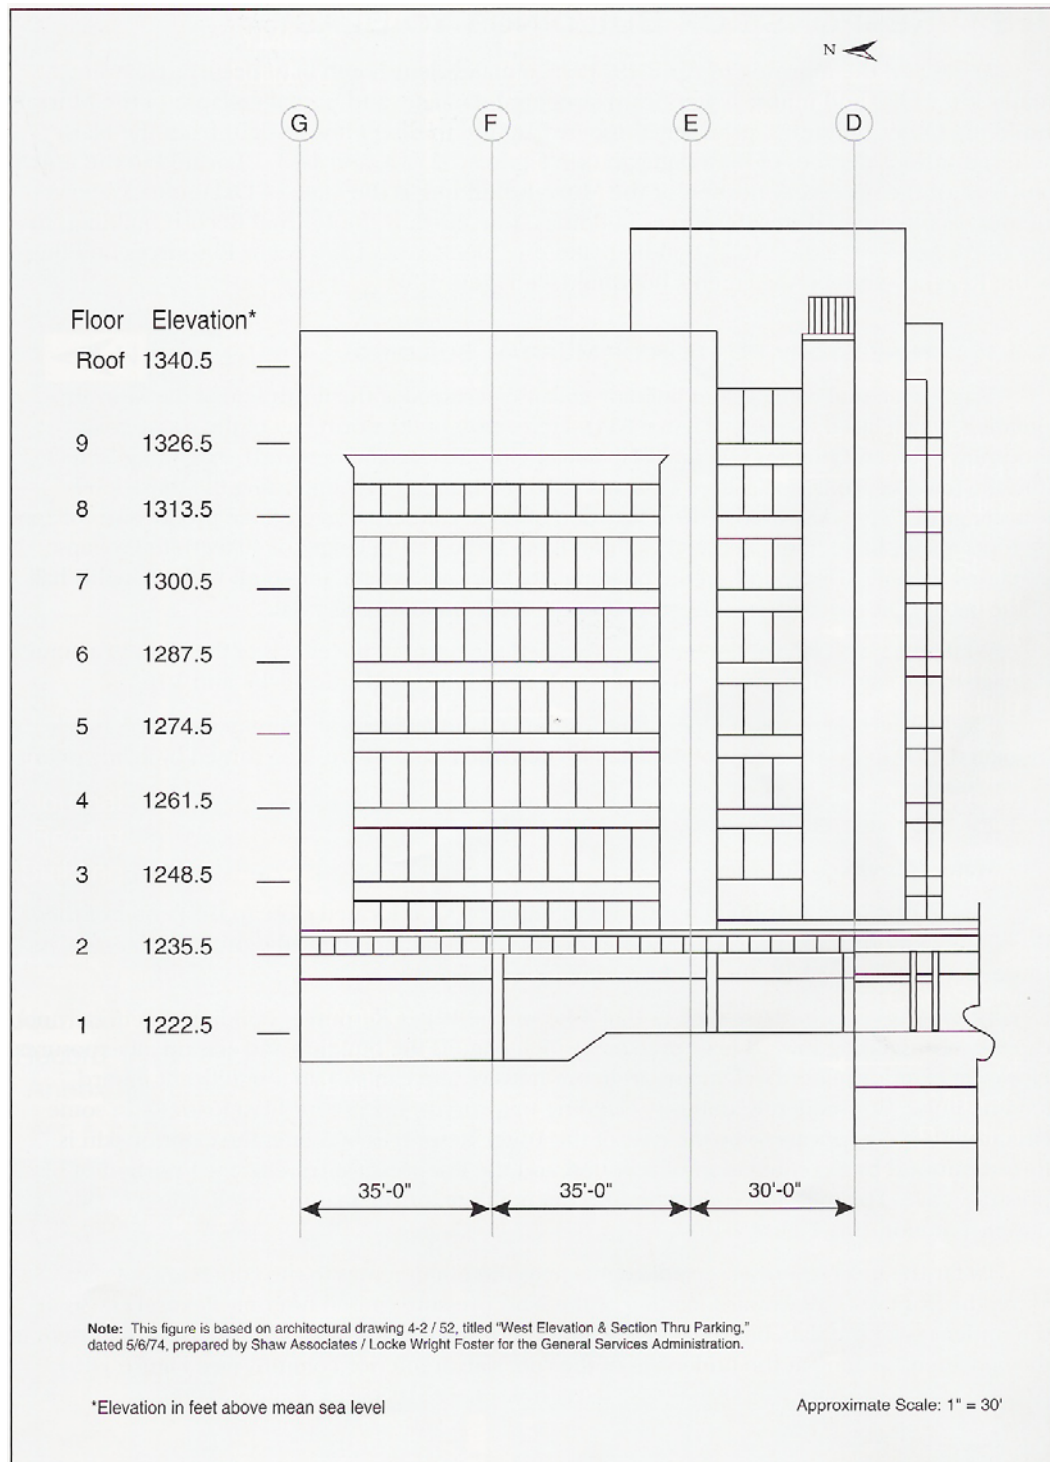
West Elevation Of Murrah Building (FEMA 1996)
